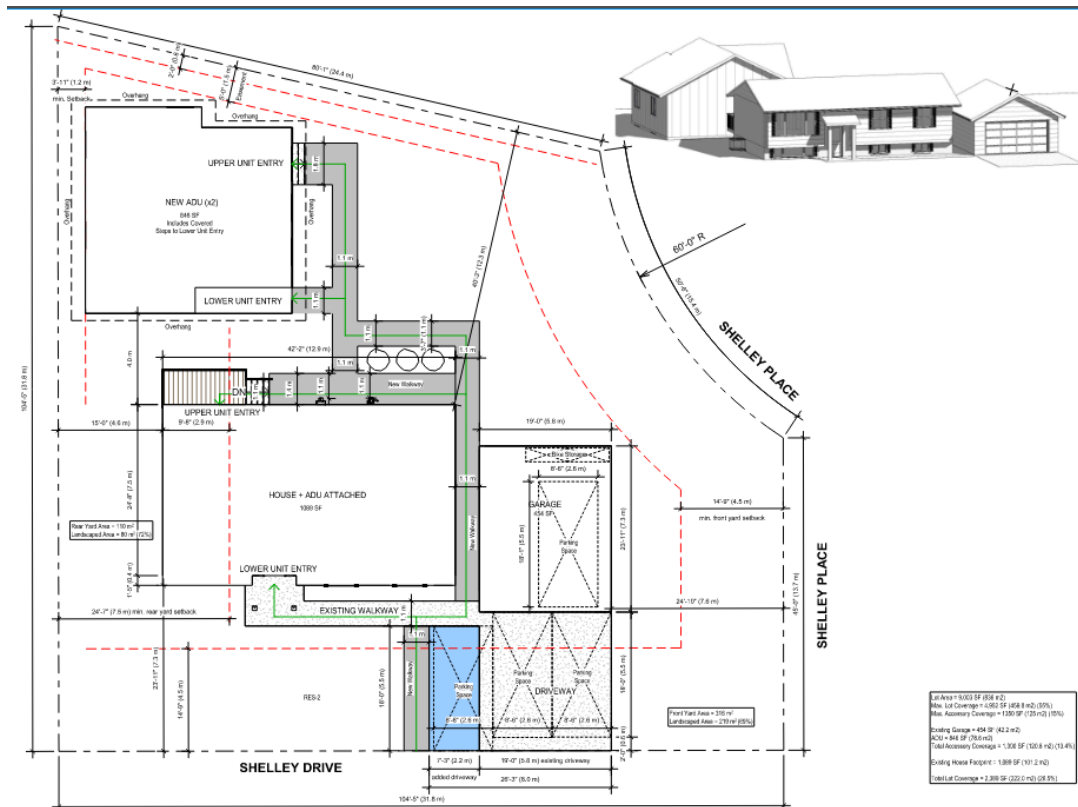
Site Plan of subject property showing existing house and proposed new building with two ADUs.
